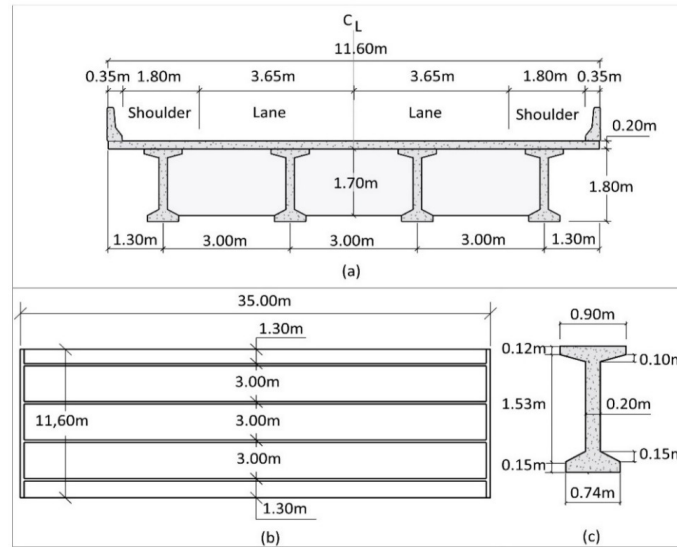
Bridge dimensions: (a) superstructure cross-section, (b) bridge plan view, and (c) girder dimensions.
